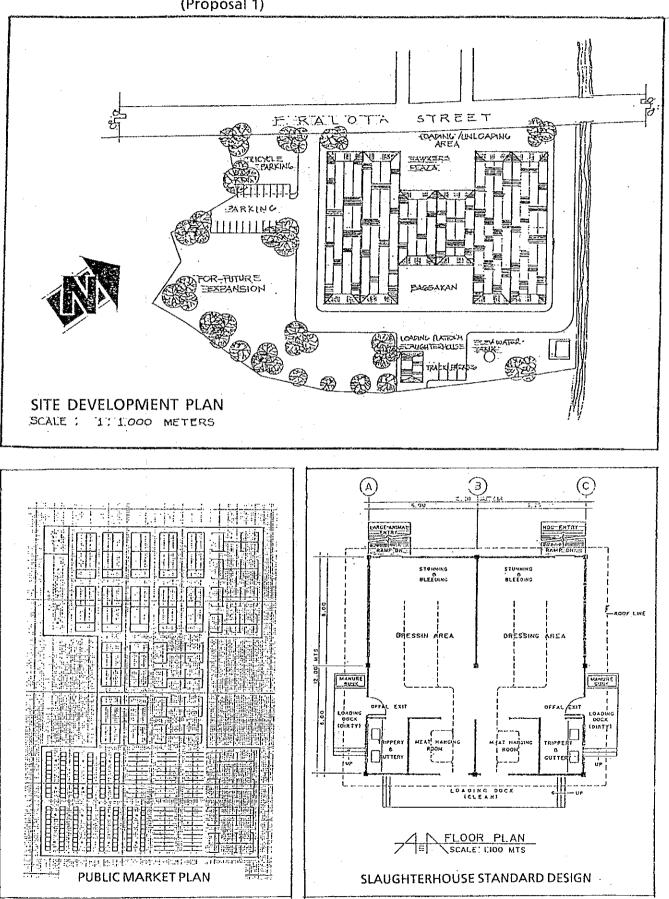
1 - 8: Danao City, New market site, market layout plan, floor plan. (Proposal 1)
